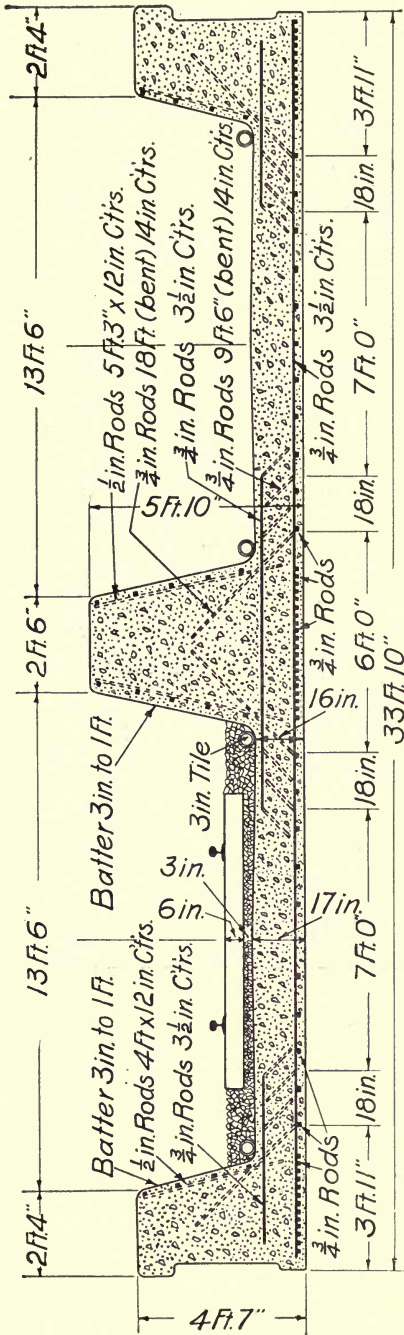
CROSS SECTION OF THROUGH GIRDER BRIDGE, C., B. & Q. R. R.
